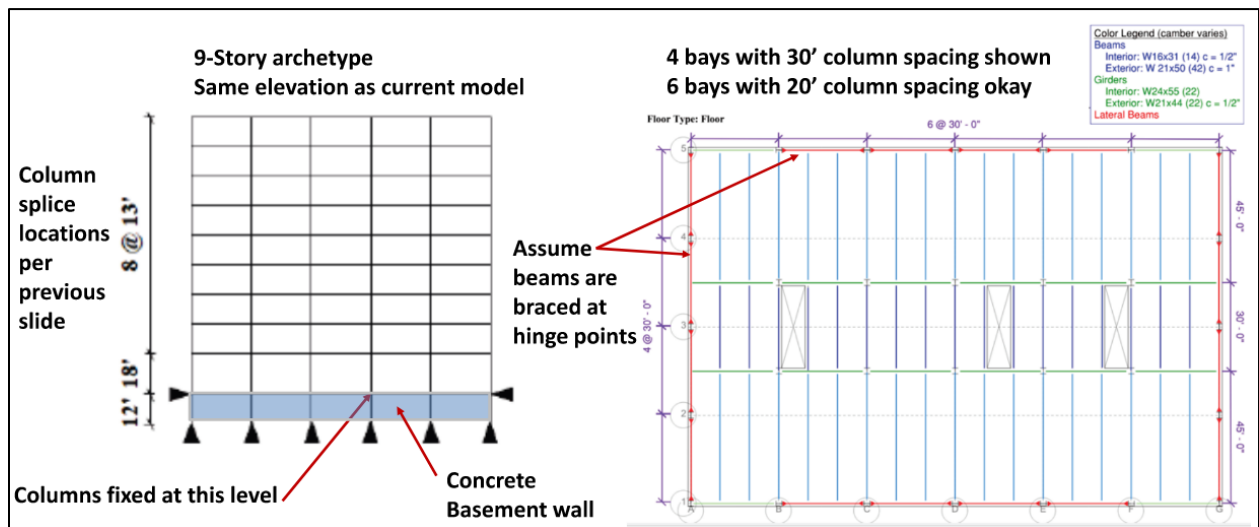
Elevation and Typical Floor Plan with Sized Gravity Framing (Sized by MKA)
